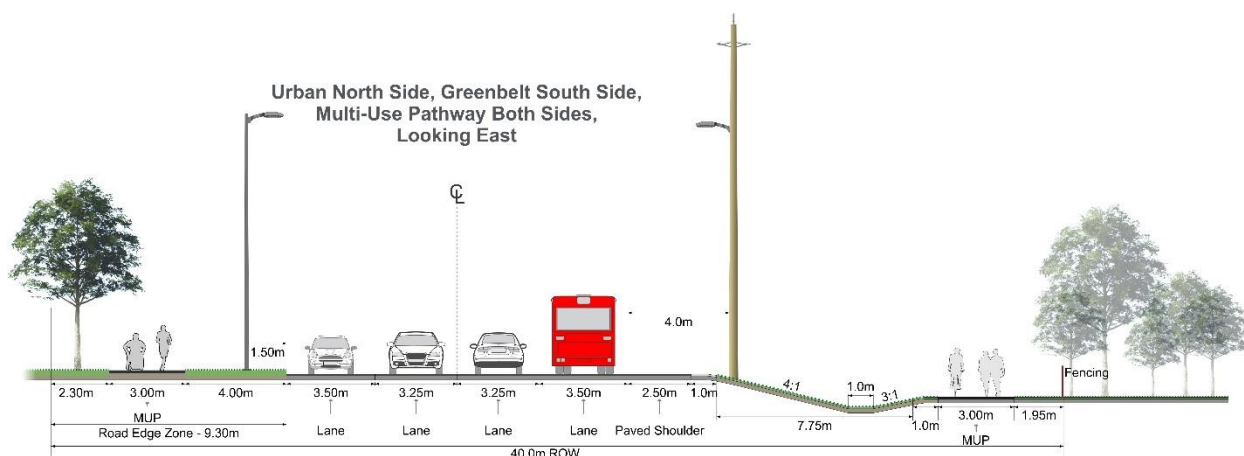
Recommended Plan, Realigned Leitrim Road Trough Greenbelt and South of Airport Business Park
